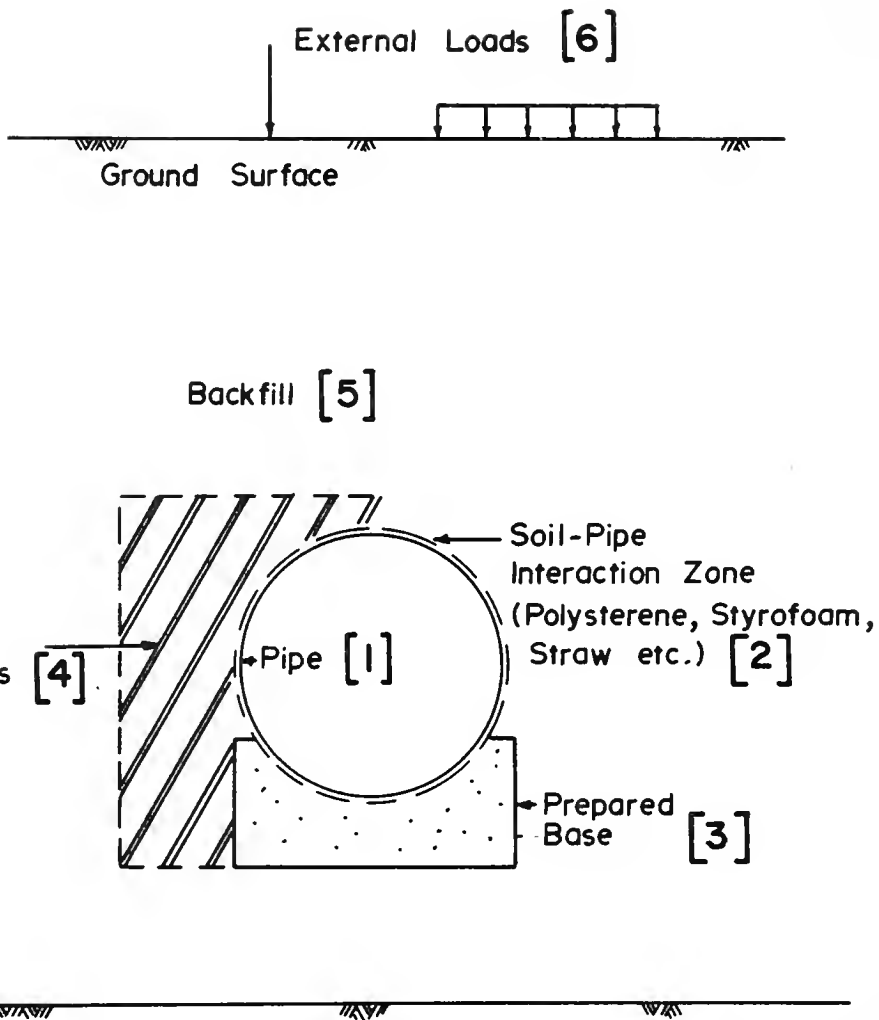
TYPICAL SECTION OF PIPE CULVERT.
